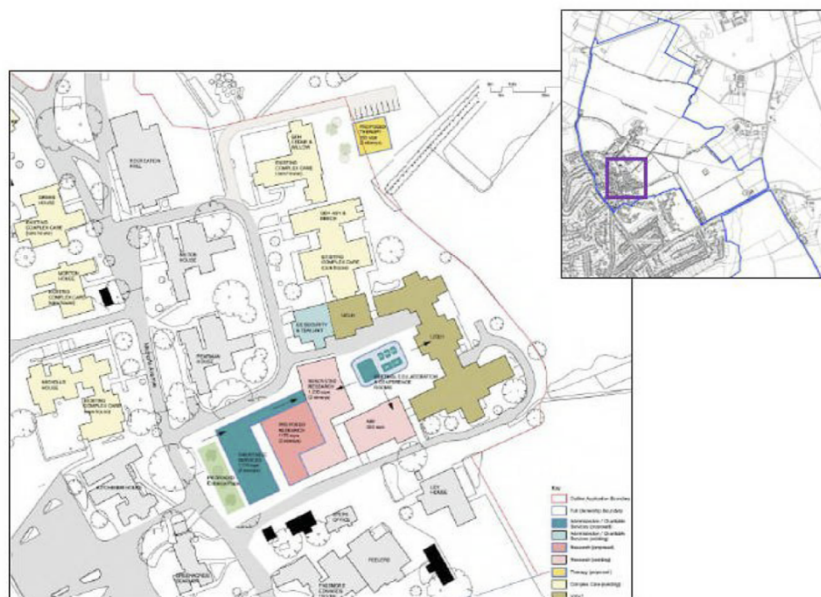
Epilepsy Society Facility Proposals (Applicant's Business Case, Page 17)
